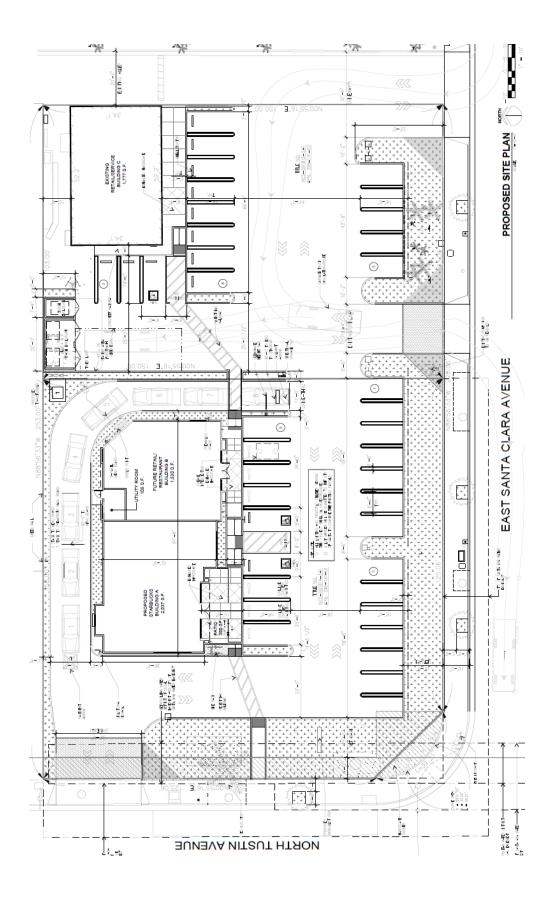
SITE PLAN 2301 NORTH TUSTIN & 2151 EAST SANTA CLARA AVENUE
